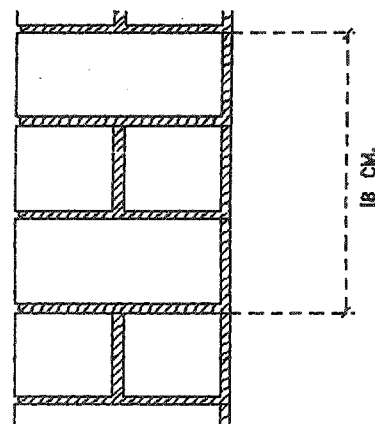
TYPICAL HENAN WALL: VERTICAL PROFILE
